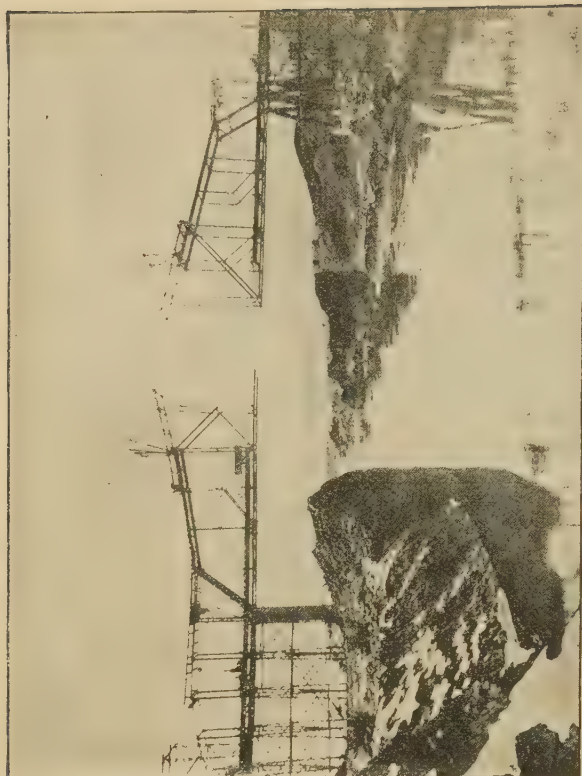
COLUMBIA RIVER BRIDGE. EDGE MOOR BRIDGE WORKS
